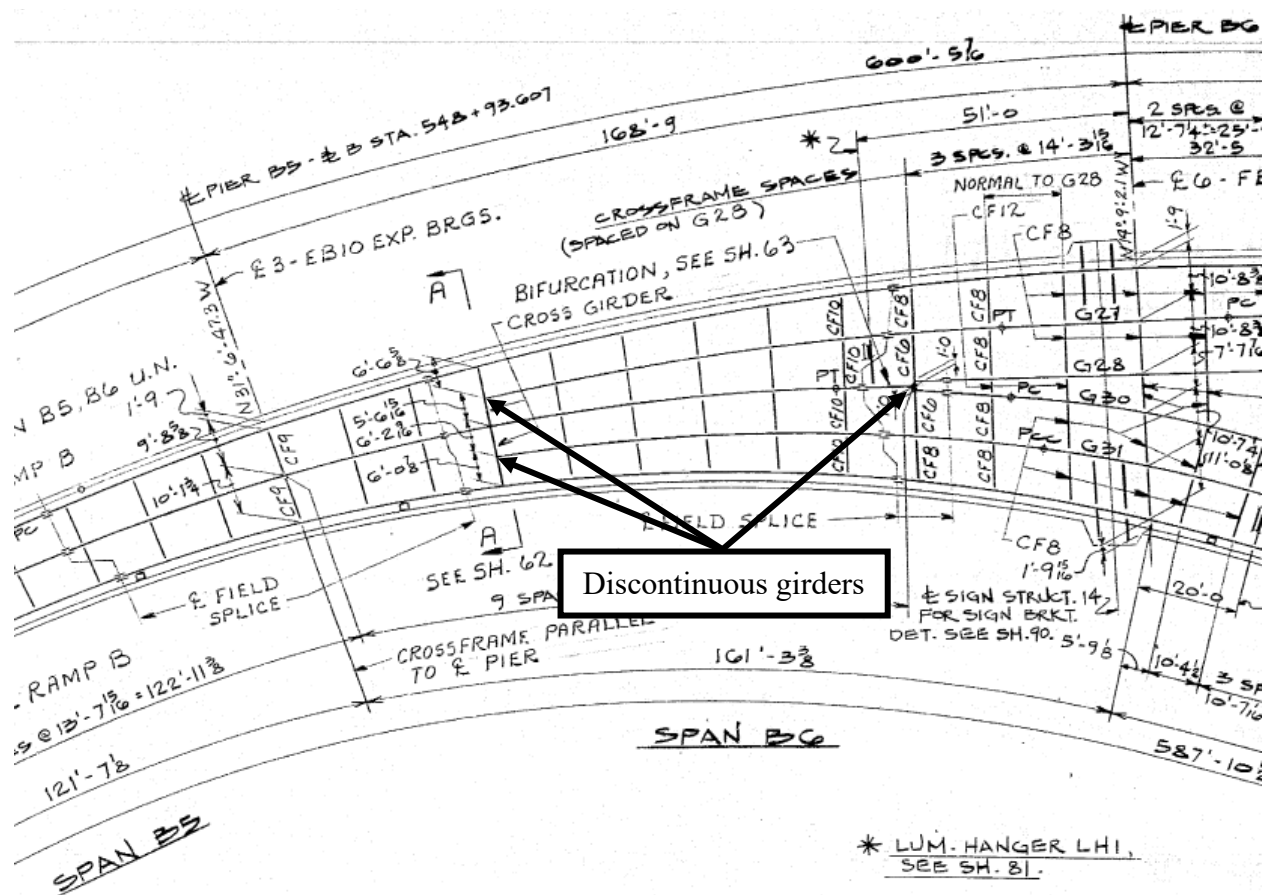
Example of a Bridge where Select Girders are Discontinuous (i.e., Partial Length) within a Span
